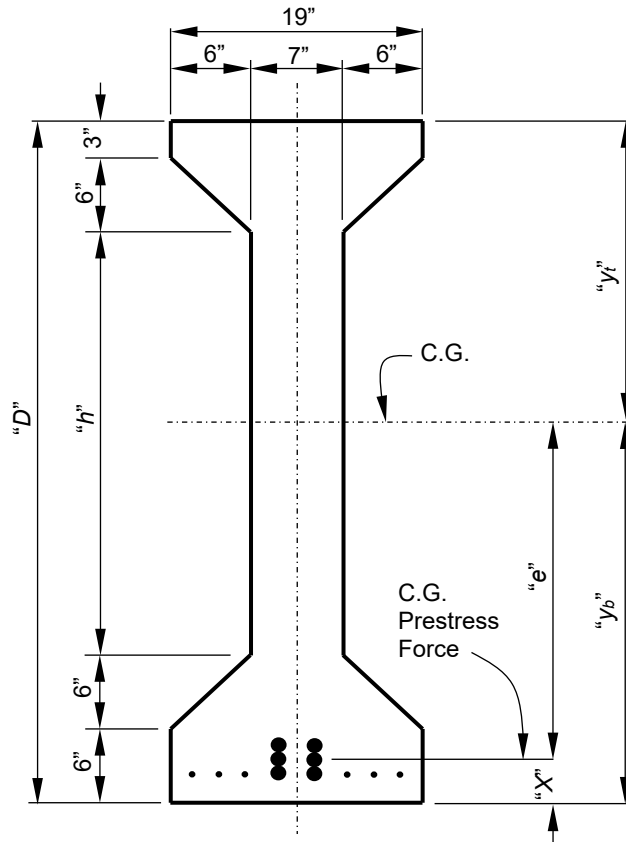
California Standard “I” Girder Typical Section
